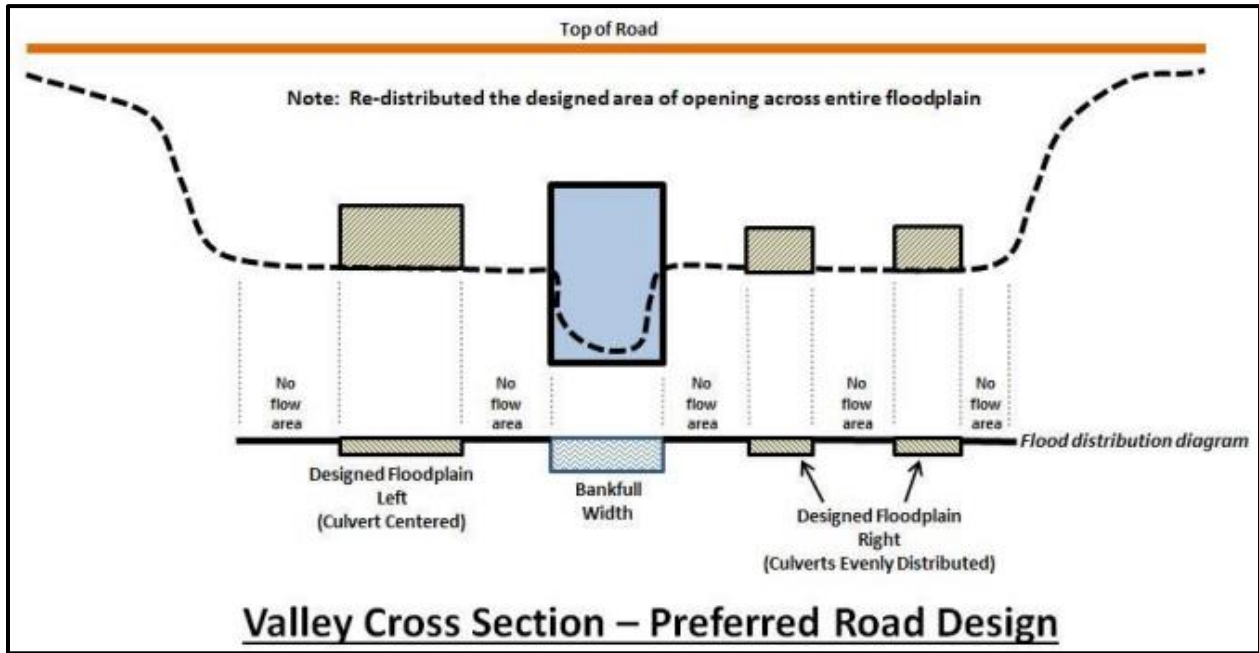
Road bisecting the floodplain with floodplain culverts.
